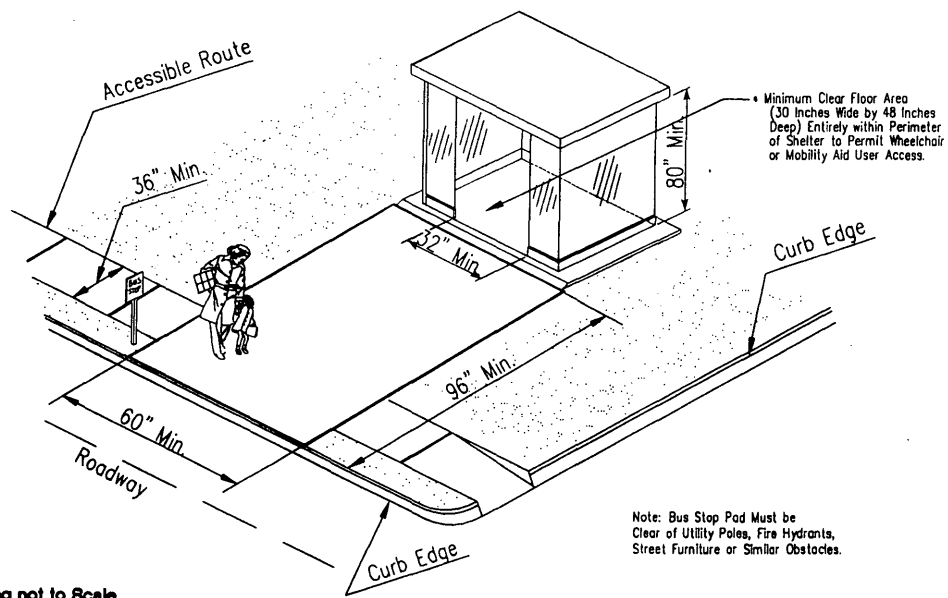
Accessible bus stop pad and shelter—minimum ADAAG dimensions.
